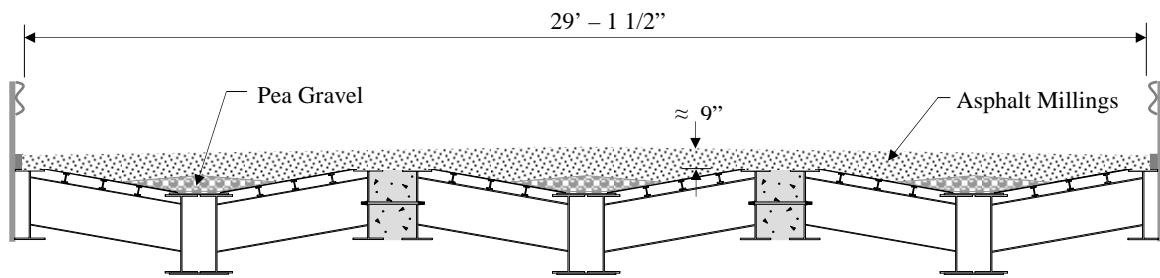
Cross-section of the Buchanan County Bridge [adapted from Wipf et al., 2003].
